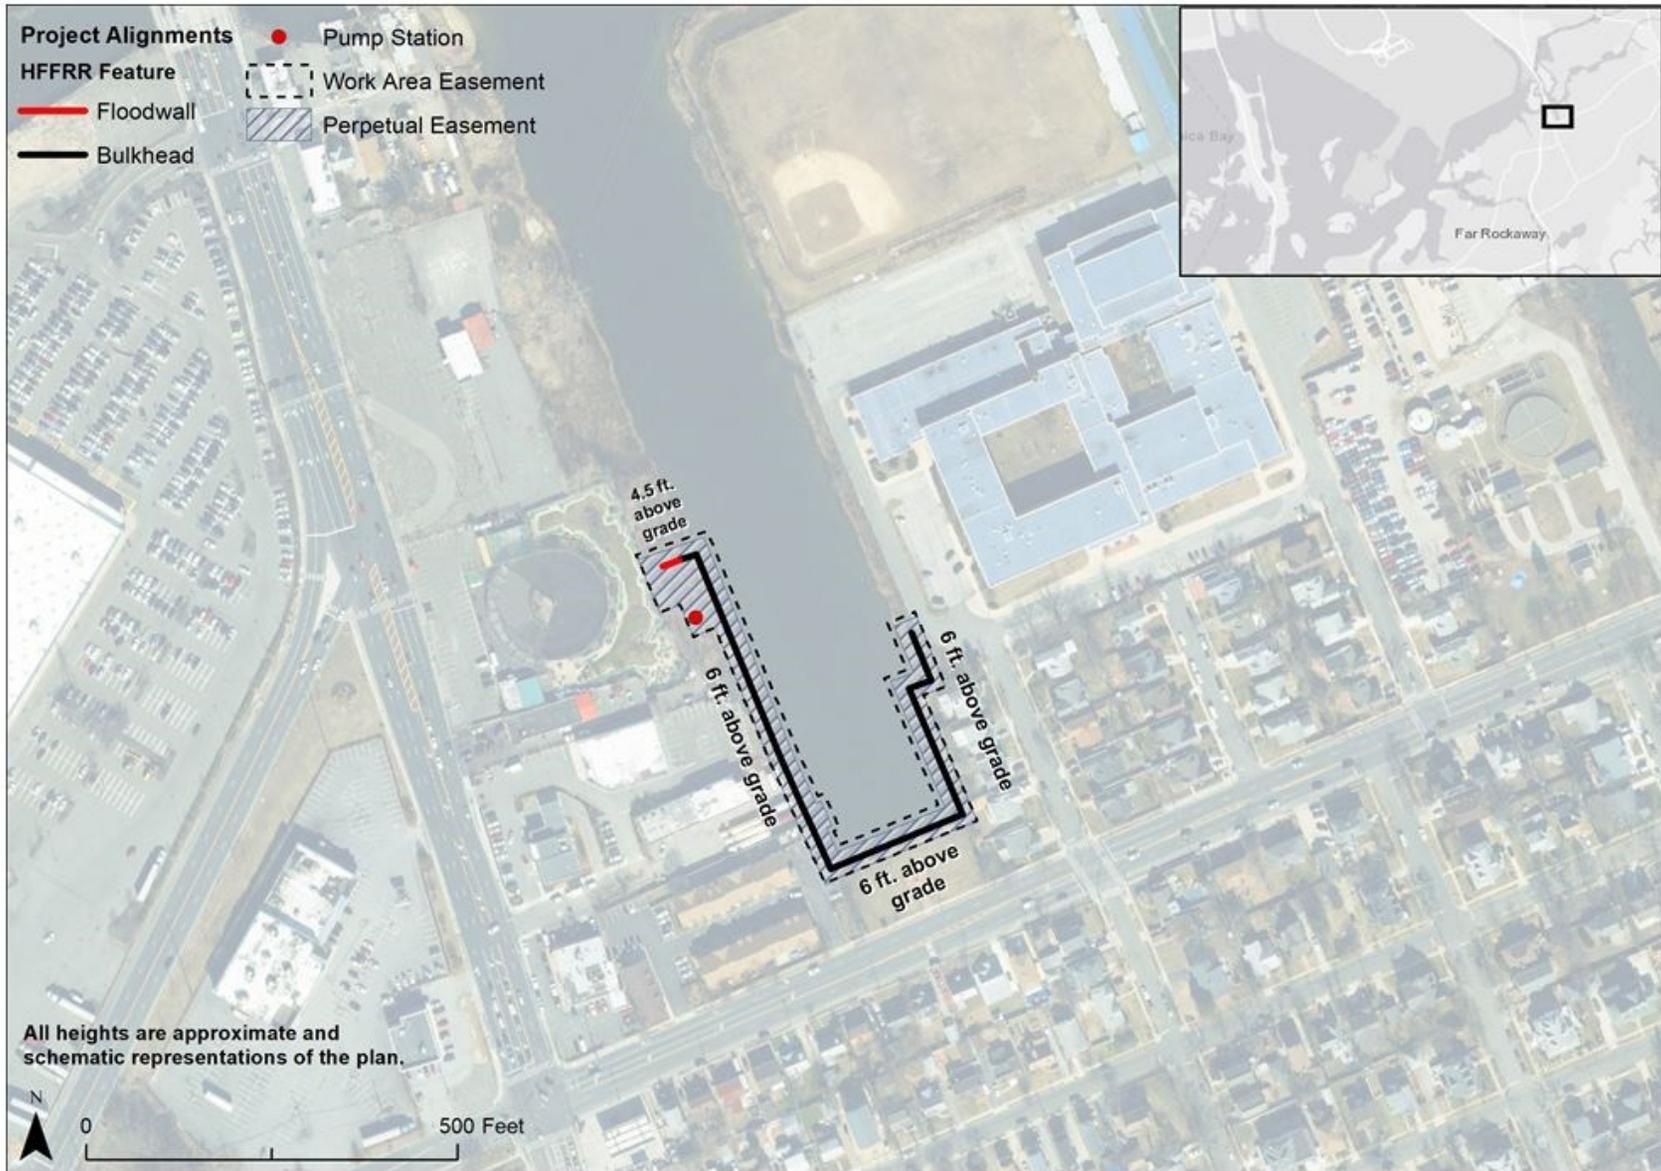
Cedarhurst-Lawrence HFFRRF Project Plan
